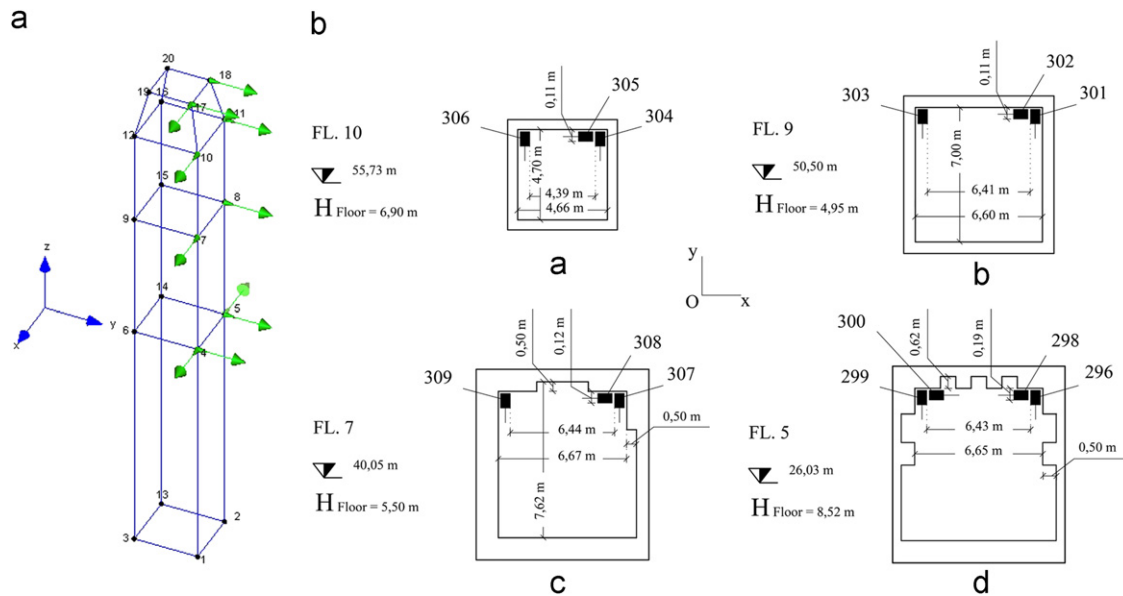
Localization of the accelerometers: (a) on the tower using a model of 20 points (4 points for each instrumented plane); (b) quoted sections of the instrumented floors.
